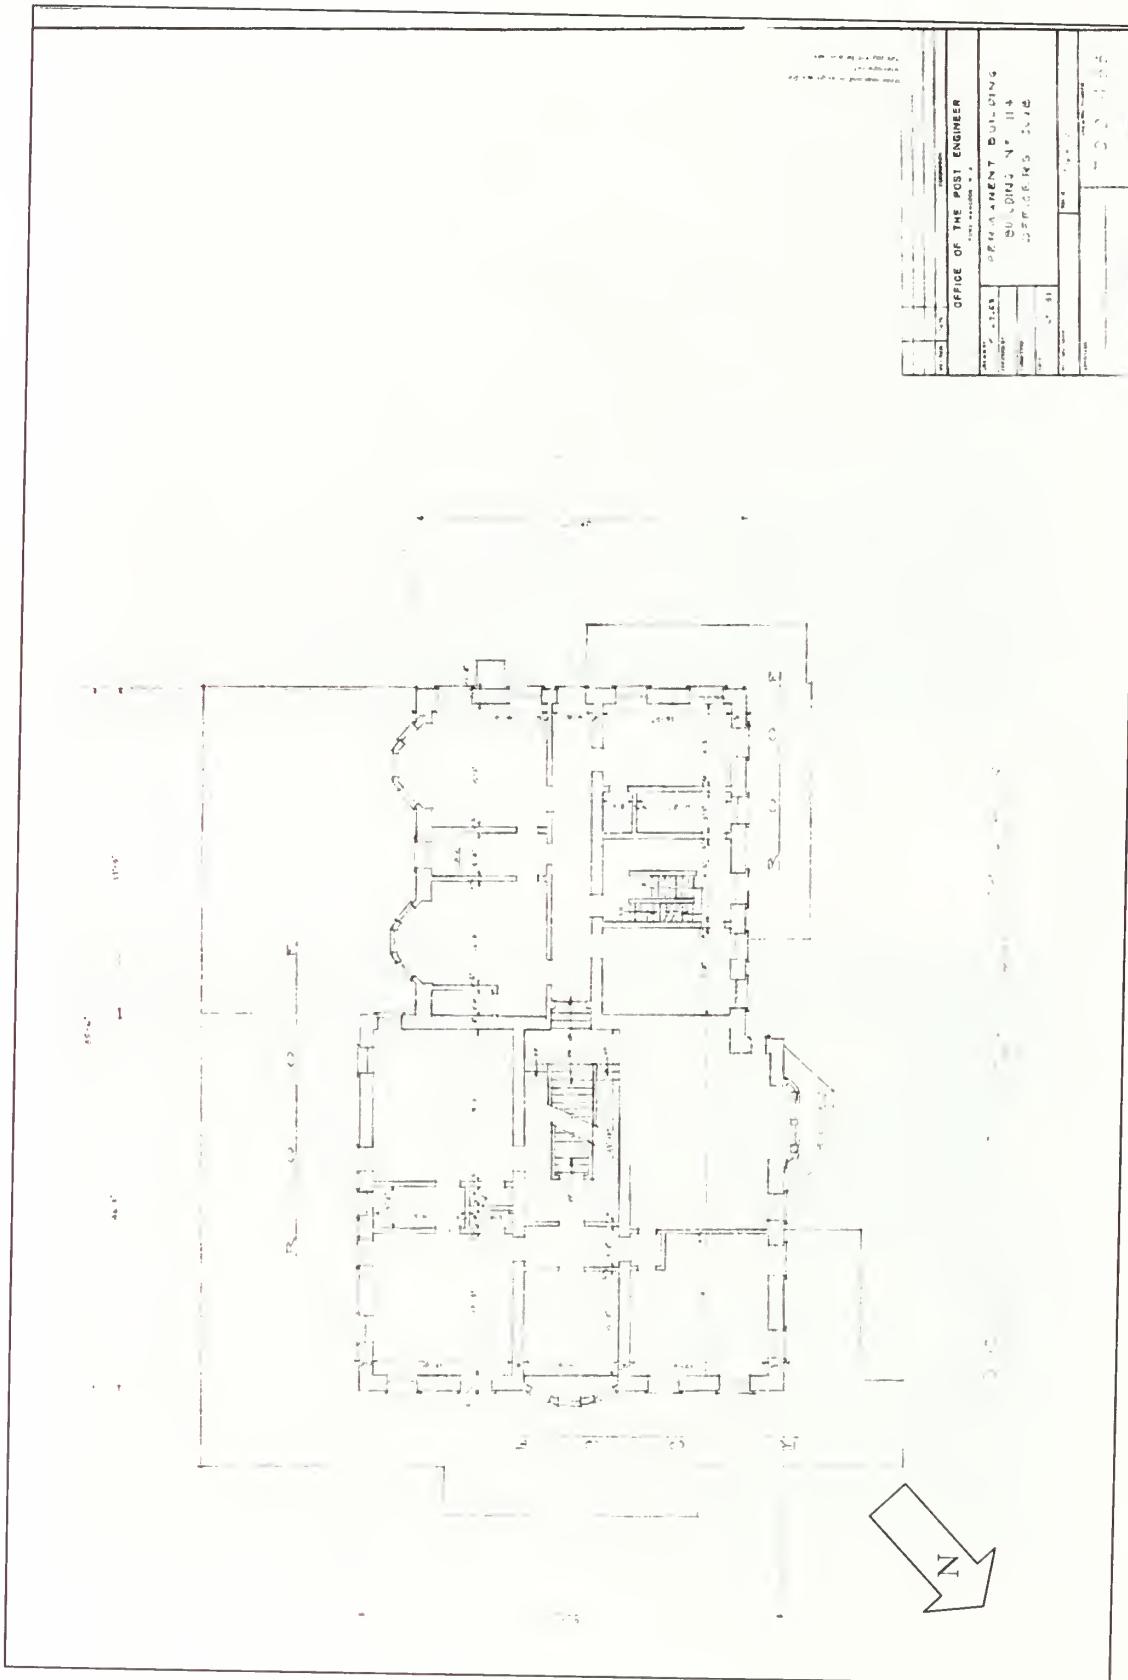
"Second Floor Plan, Permanent Building, Building No. 114, Officers Club," 1959.
